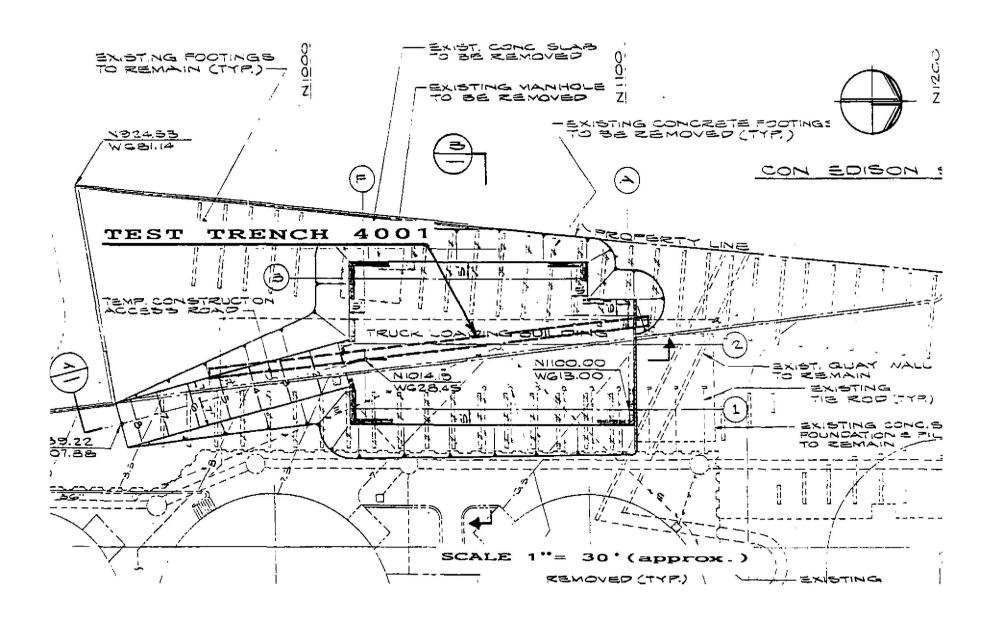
Location of archaeological test trench 4001 shown on current excavation plan.
